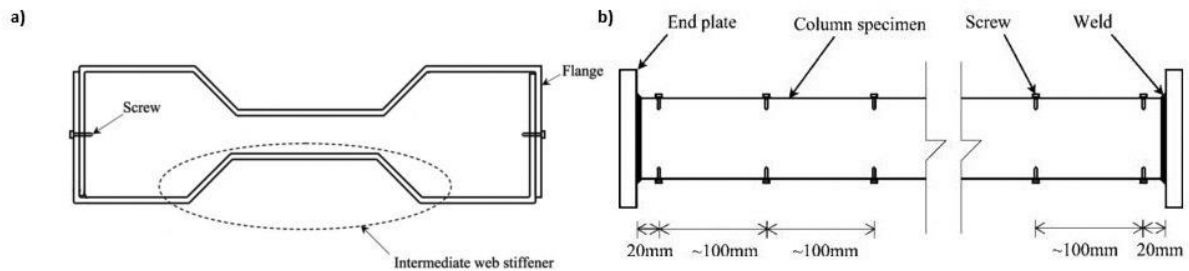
a) Cross section of cold-formed steel member and b) arrangement of screw spacing (Young and Chen, 2008)
